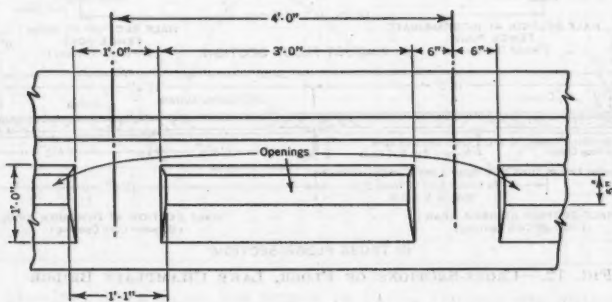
ELEVATION SHOWING TYPICAL CURB ELEVATIONS.
